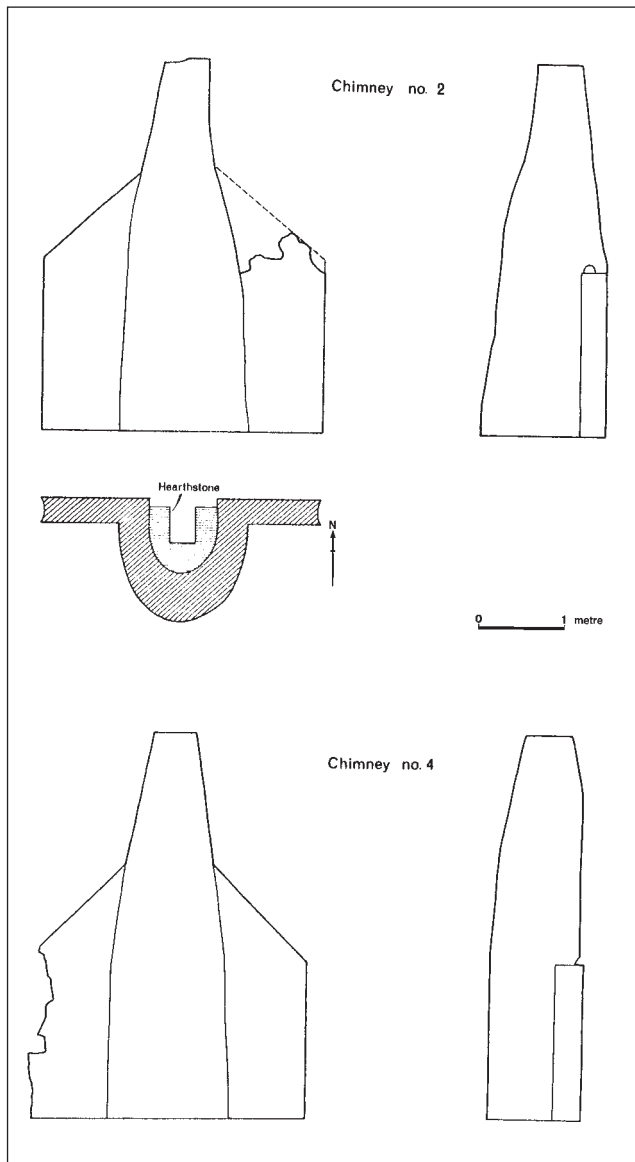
Married Quarters round chimneys: elevations of chimneys 2 and 4.
